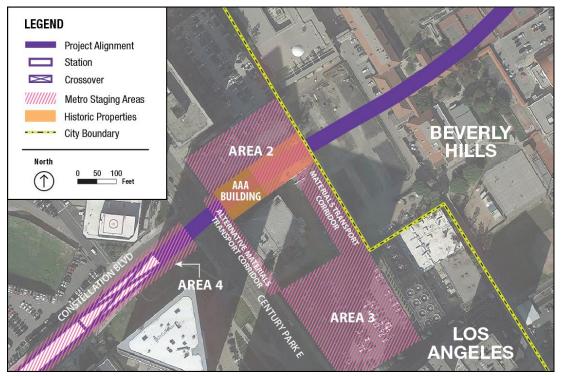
Project Features and Construction Staging Areas relative to the AAA Building
